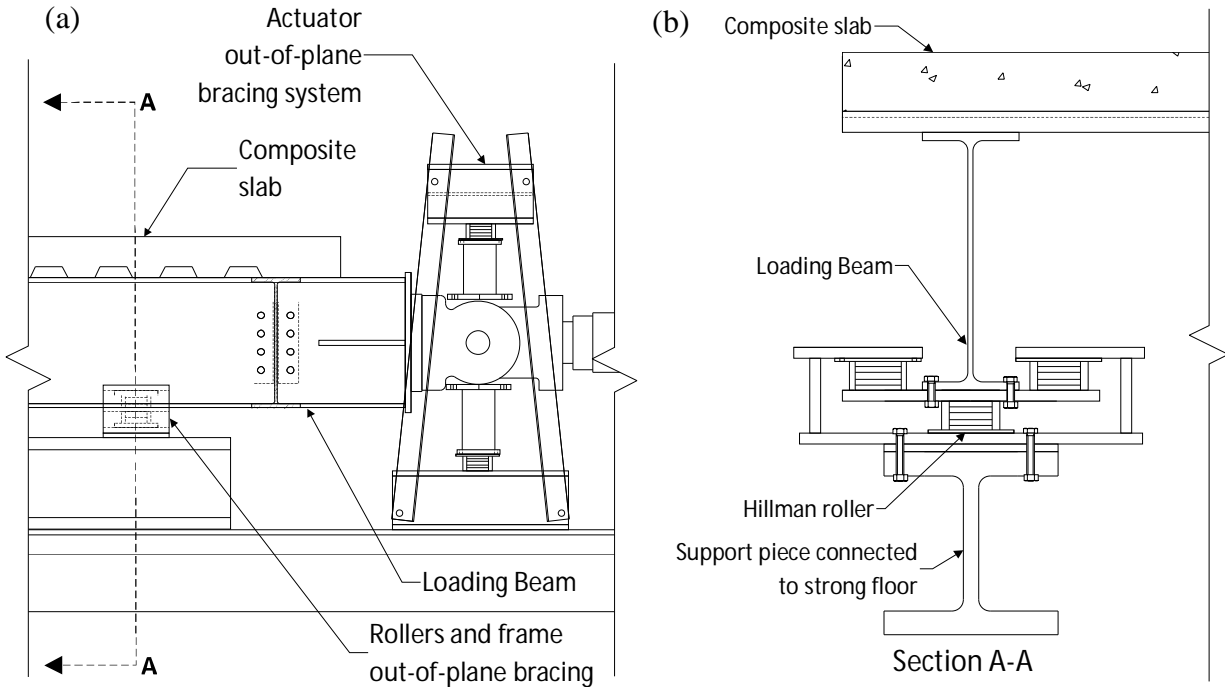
Out-of-Plane Bracing: (a) Actuator Out-of-Plane Bracing (b) Loading Beam Out-of-Plane Bracing
